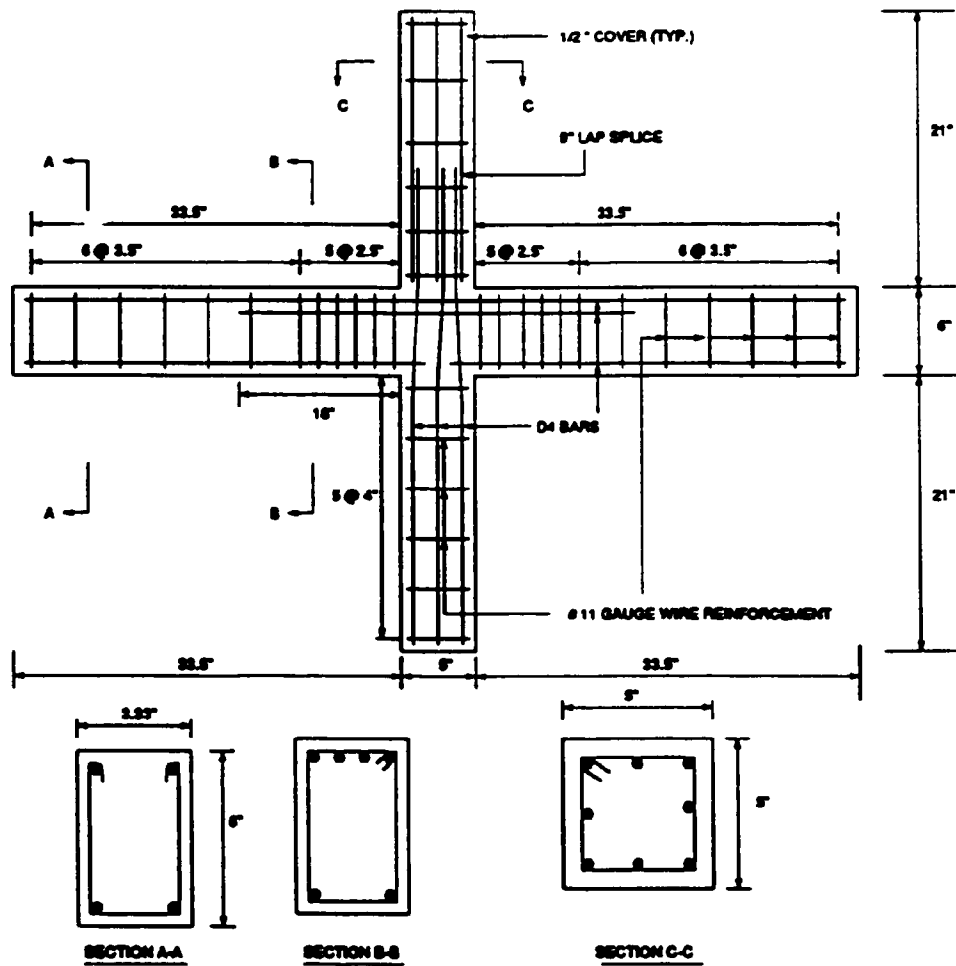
Reinforcement Diagram for the Original/As-built Specimen
